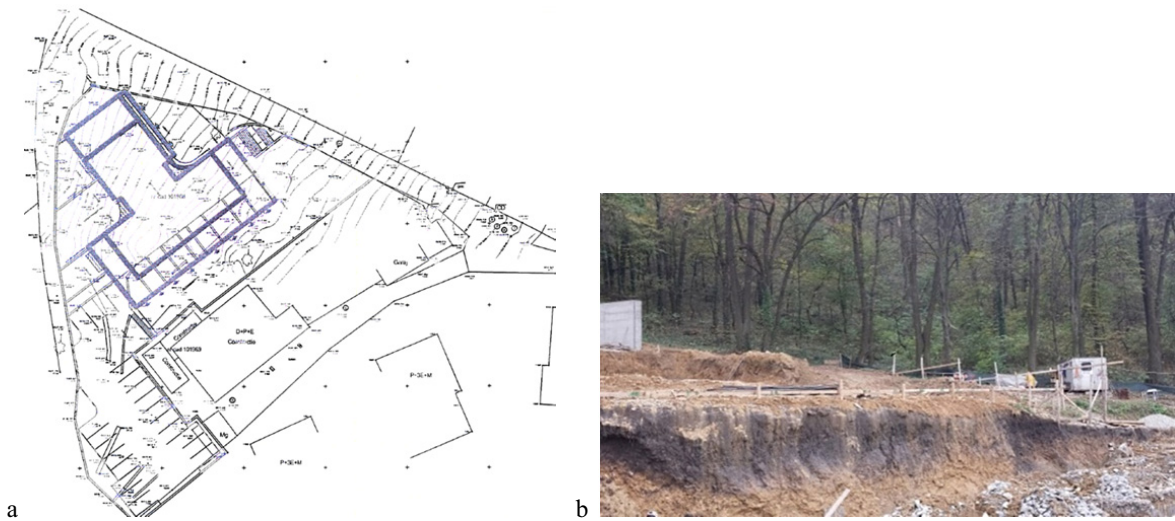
(a) Proposed site plan; (b) Overview of the site.
